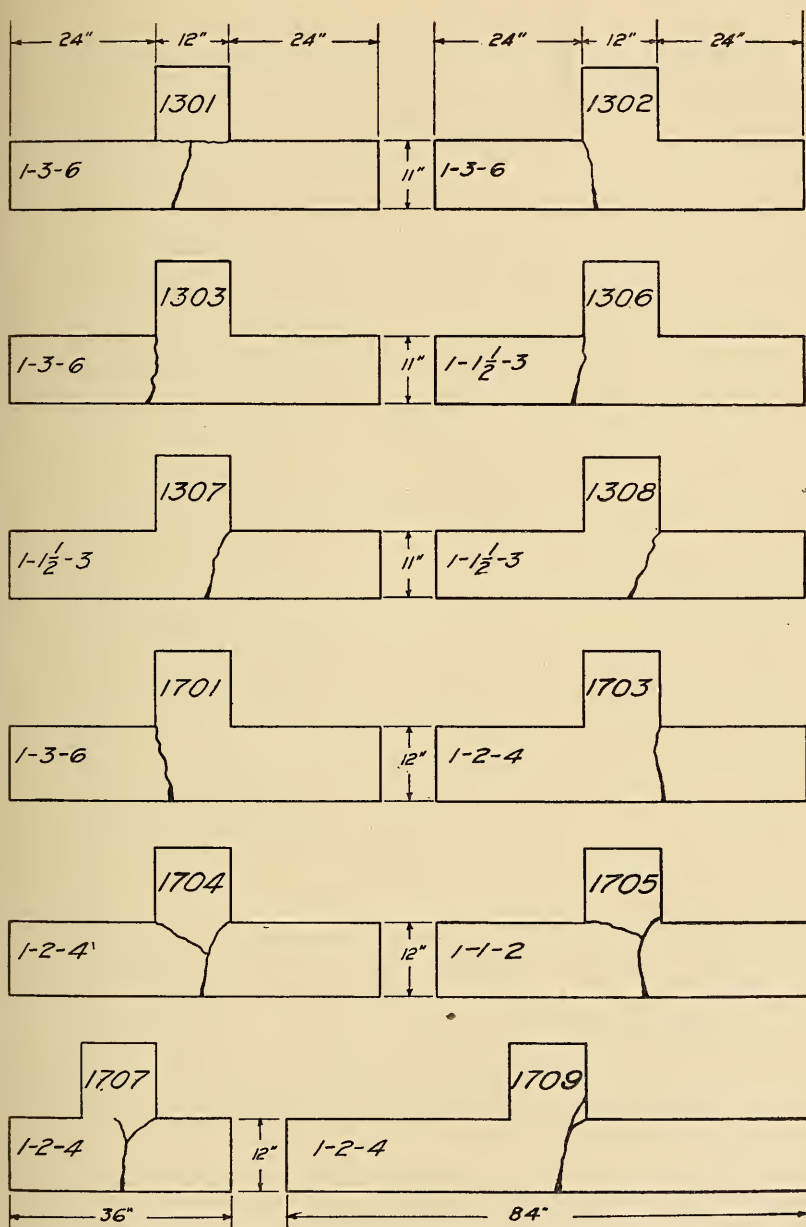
UNREINFORCED CONCRETE WALL FOOTINGS.
